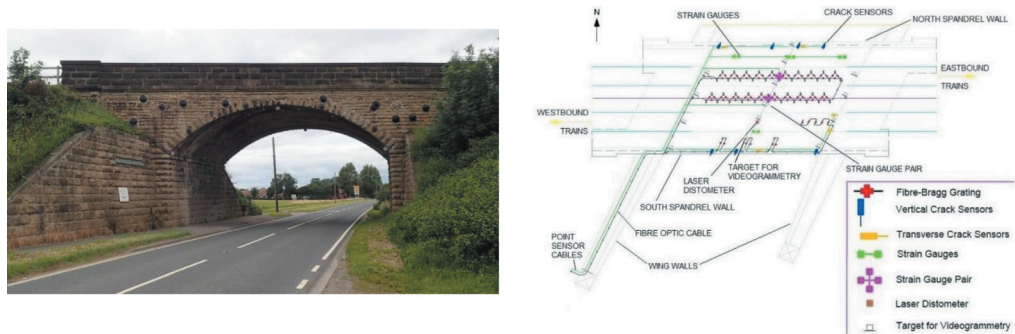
Elevation view of the CFM-5 bridge and its sensor installation plan.
